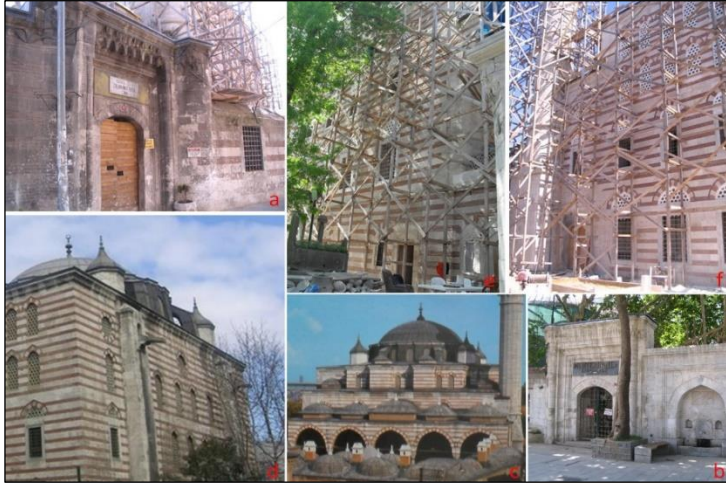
a-b-Entrance gate of the Kulliye from Zal Pasha Street and Feshane Street, garden walls c-d- front and rear façade walls of the mosque e-f- right side and left side façade walls of the mosque
